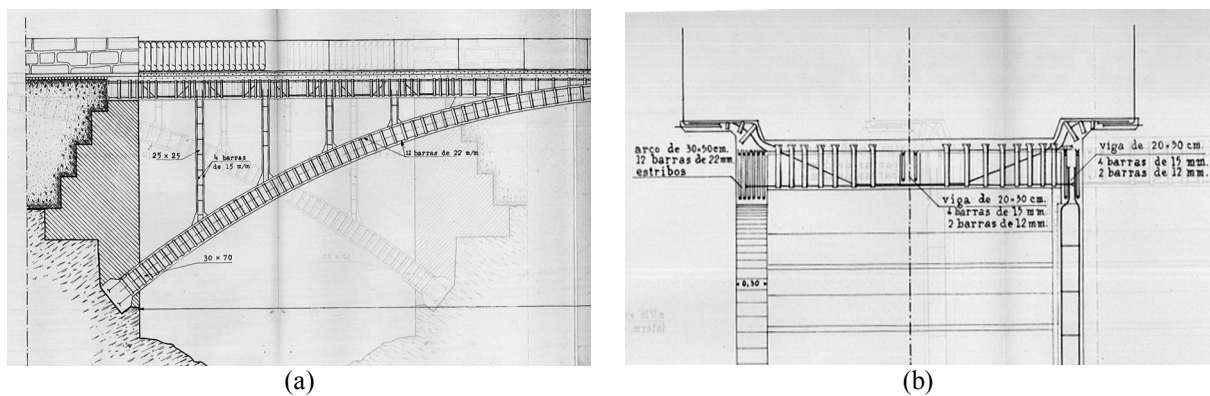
Original geometry and steel reinforcements: (a) downstream elevation; (b) cross-section of the deck
